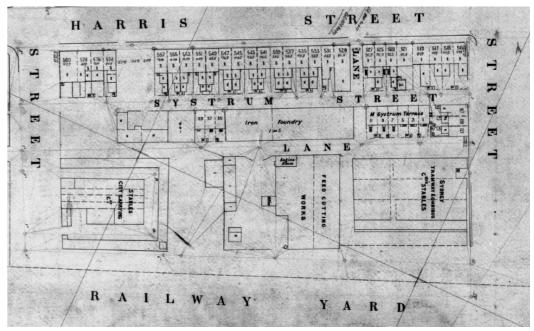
c.1886 Plan of Southern Block (Macarthur St to Mary Ann St) of current Powerhouse Museum site. (Source: Sydney Water PWDS 1544-S209)
